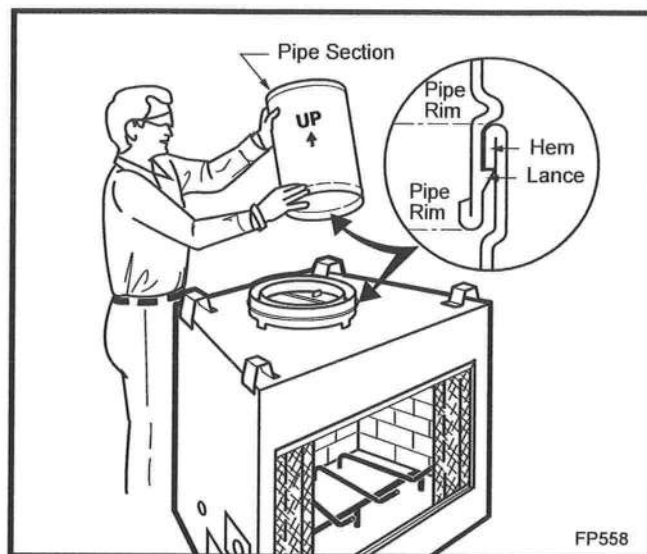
Install pipe, listening for the snap-lock to fasten.
